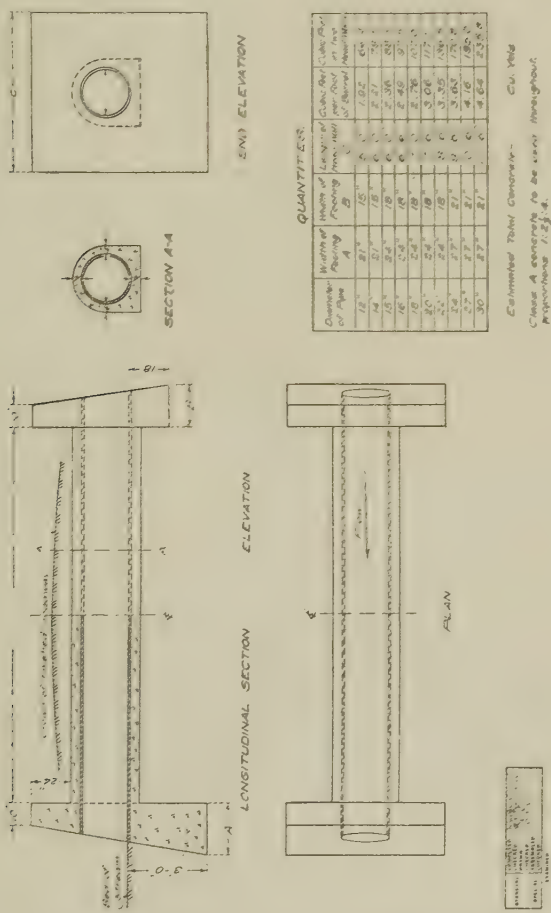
PIPE CULVERT AS DESIGNED BY THE STATE HIGHWAY DEPARTMENT OF ILLINOIS.
